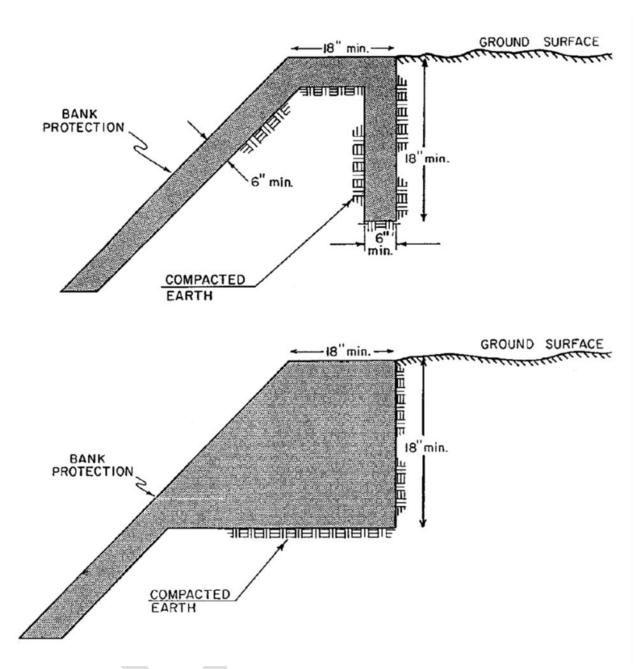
Typical Bank Protection Key-In (Not-To-Scale)
